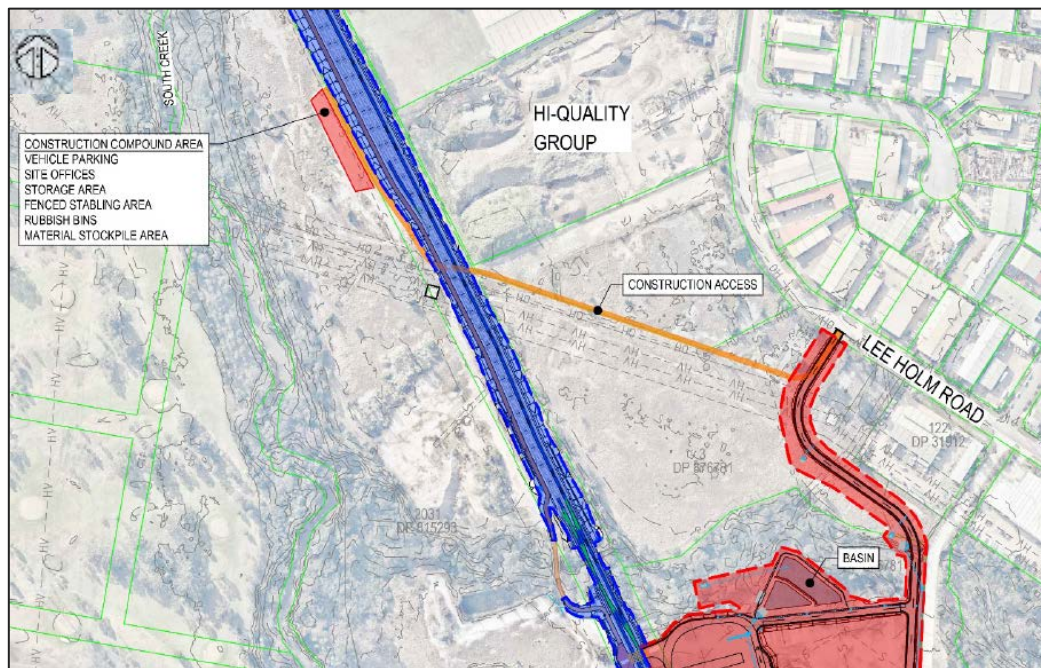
| Construction compound area at northern portion of the site (source: Applicant's Modification Report)
